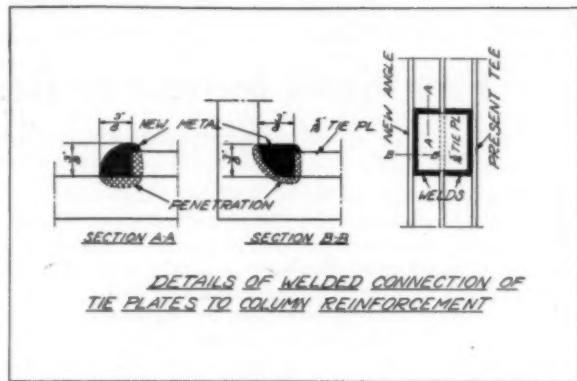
Welding Details in Reinforcing Gray-Type Column
